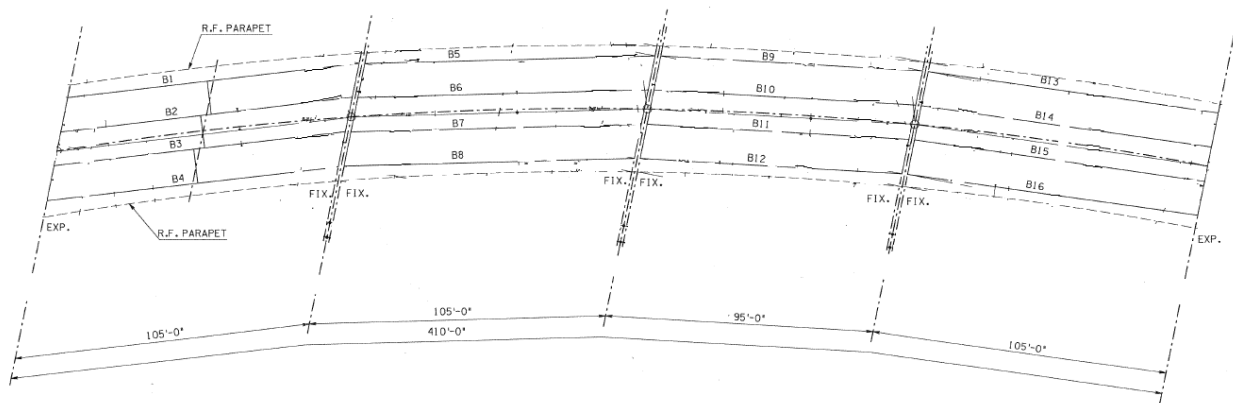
Framing Plan of Horizontally Curved Bridge (PennDOT, 1996)
